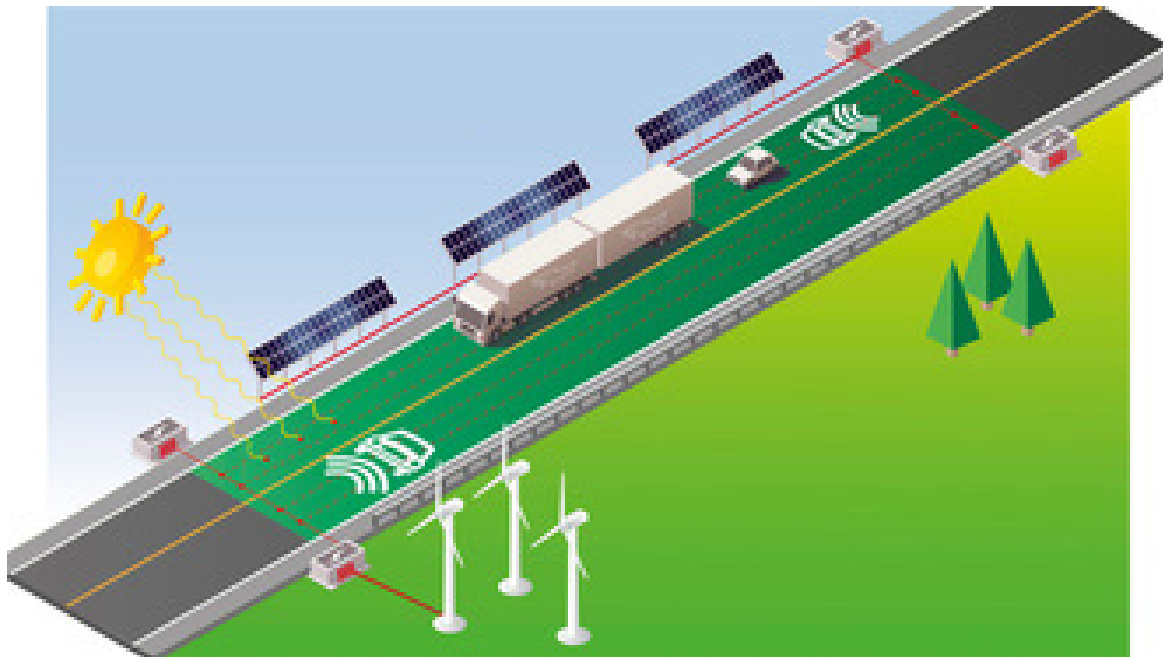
Wireless charging pavement (Valle, 2018)
